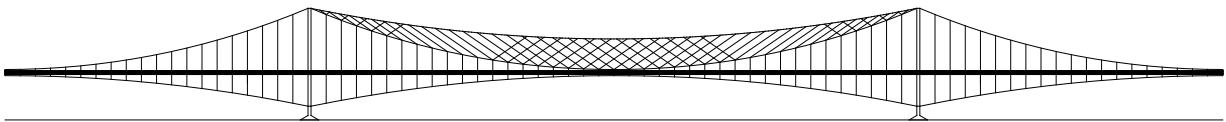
Rational Structure of Cable Truss for Suspension Bridge
